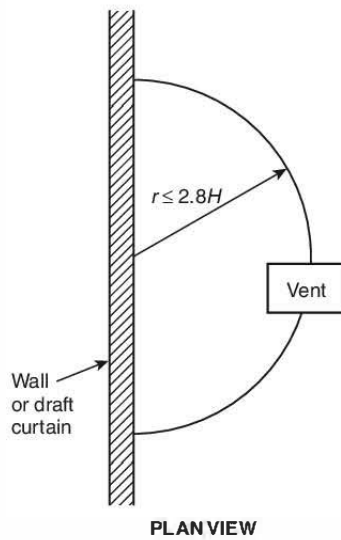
Vent Location near a Wall or Draft Curtain (plan view).
